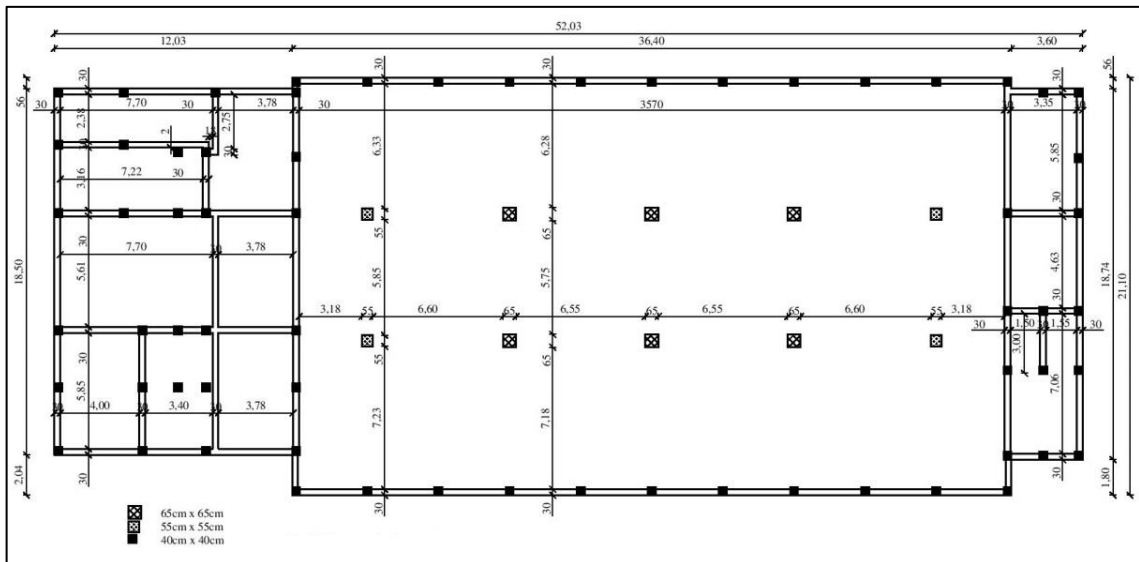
Detail structural plan view (Bohn Deep Foundation Ltd)
